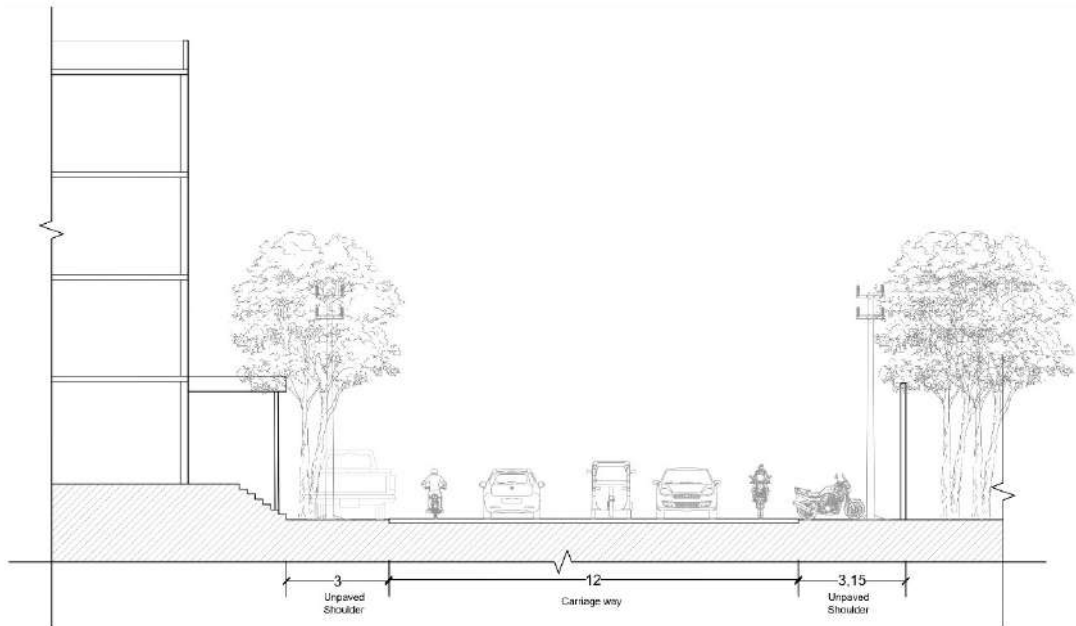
Road Cross Section: SIRIS Road near GVK Hospital
